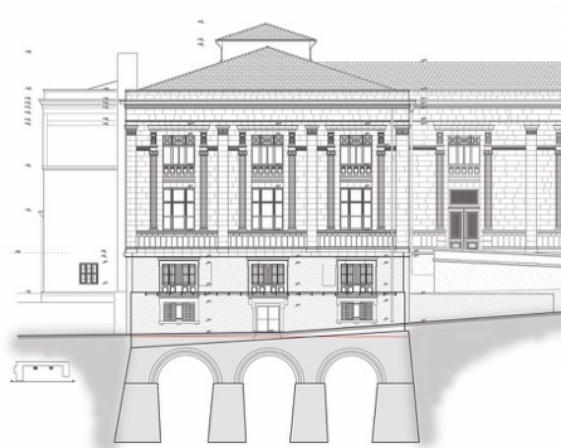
The superimposed drawing of the Underground East Elevation of Vallauray period and the Elevation of the Second Phase of IAM (produced by the author, elevation's source: Restoration Project prepared by *Seçkin Mimari Hizmetleri* IDSM-Archive).
